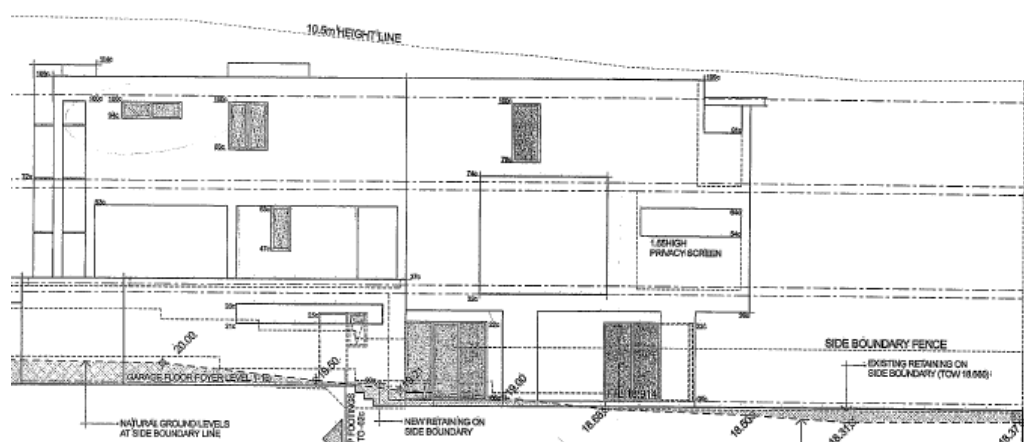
Northern elevation of 14B Fraser Road. Note the lack of major openings on the upper two floors.
